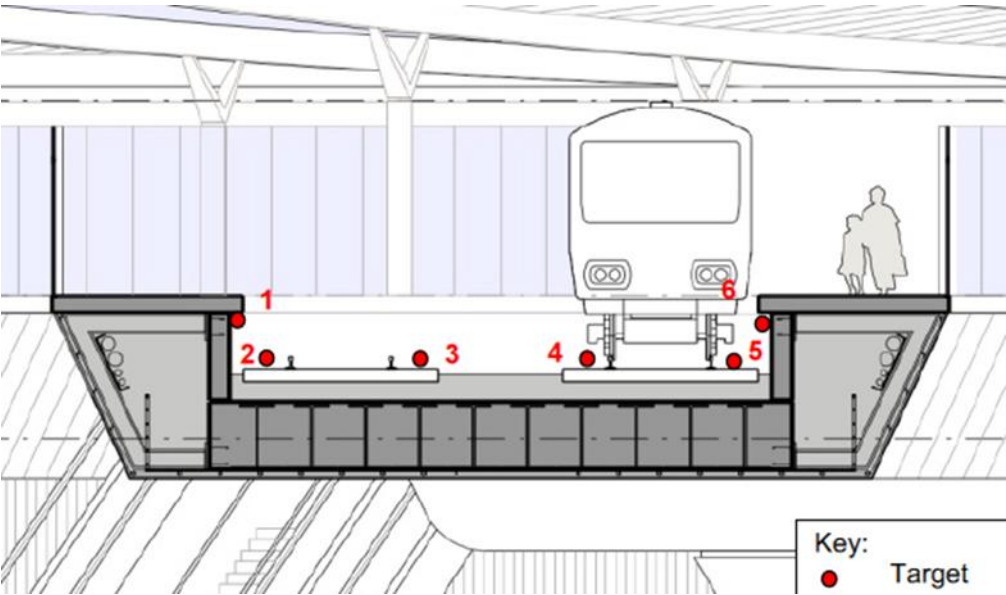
Typical prism layout for track monitoring at Network Rail (image taken from the London Bridge Station Development Monitoring Specification)
